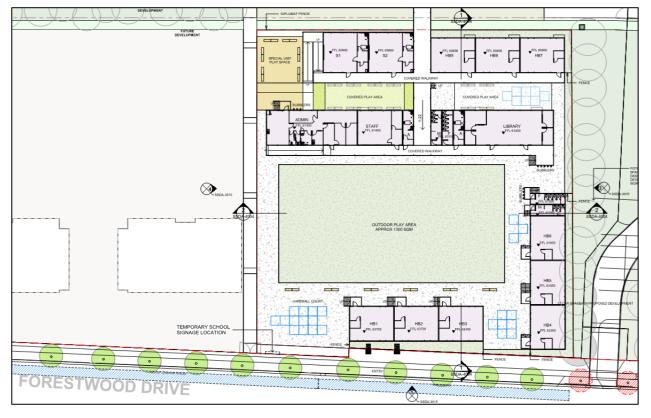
Design Plan for Temporary School – New Public School at Mulgoa Rise
